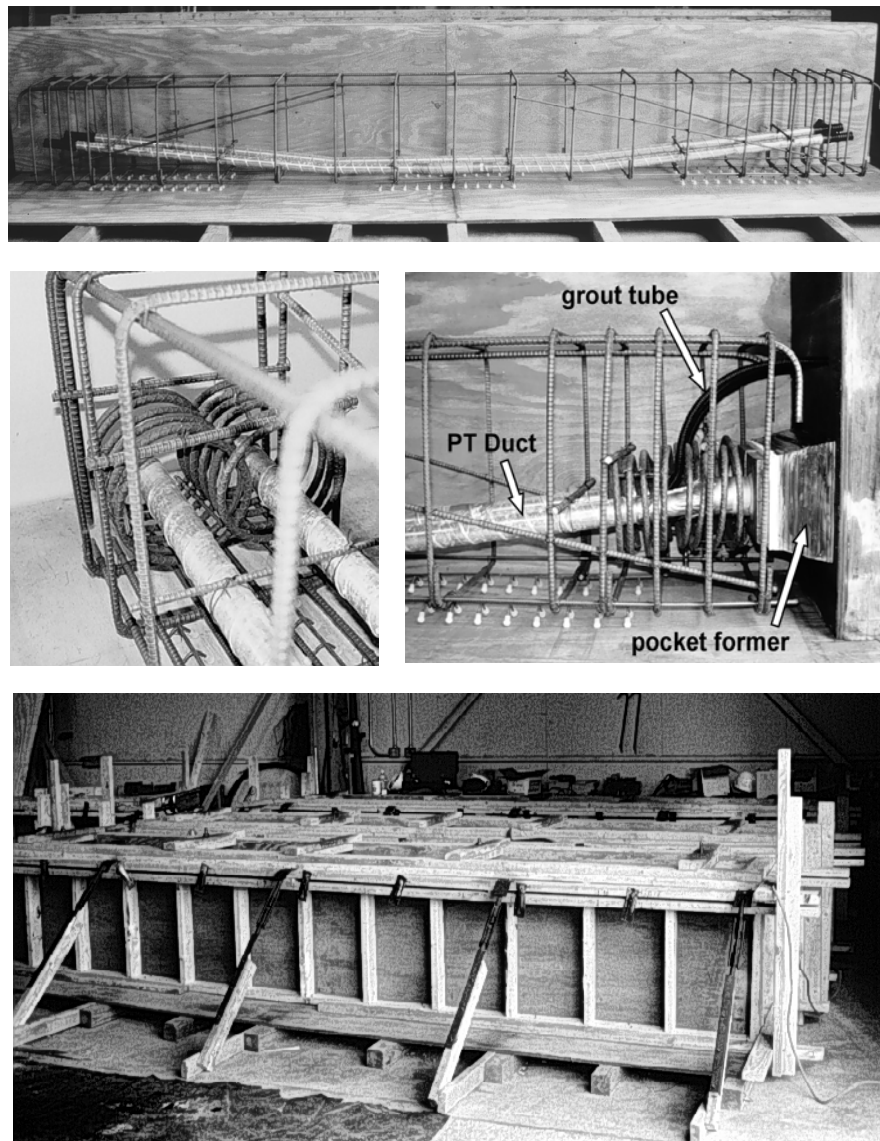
Reinforcing Cage, End Detail for PT Beam, and Formwork^{4.2,4.3}
